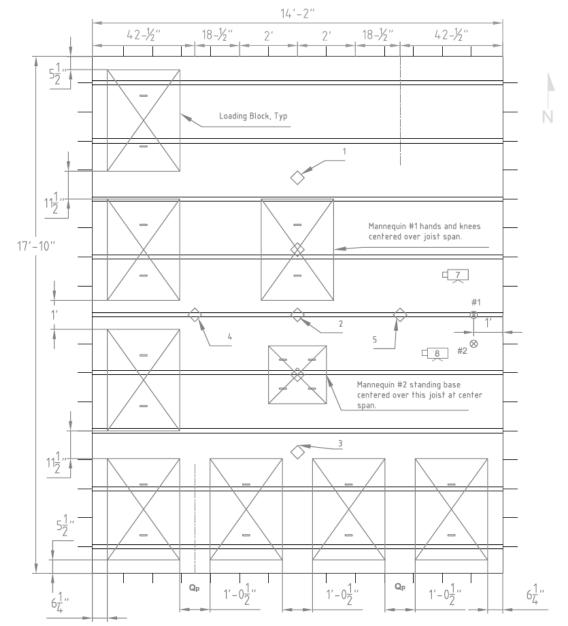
Loading and Instrumentation Layout (See Figure A.6.8)
